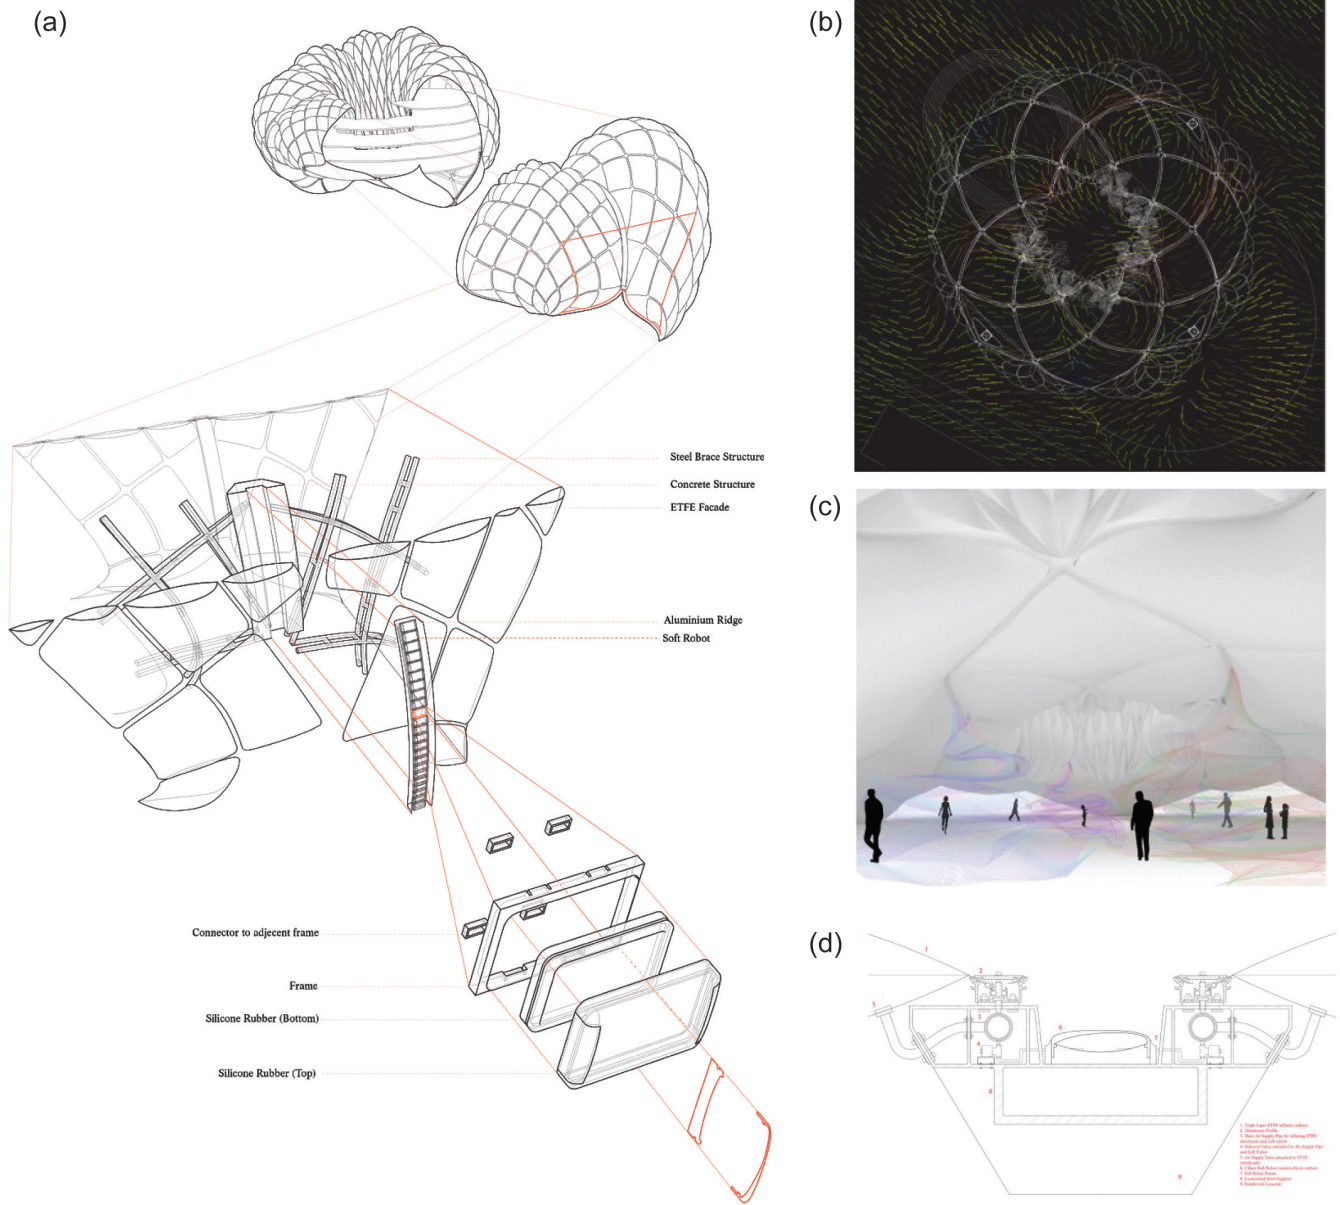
(a) Exploded axonometric of soft robot application. (b) Speculated flow of fluids. (c) Interior view of large scale assembly. (d) Construction drawing.
